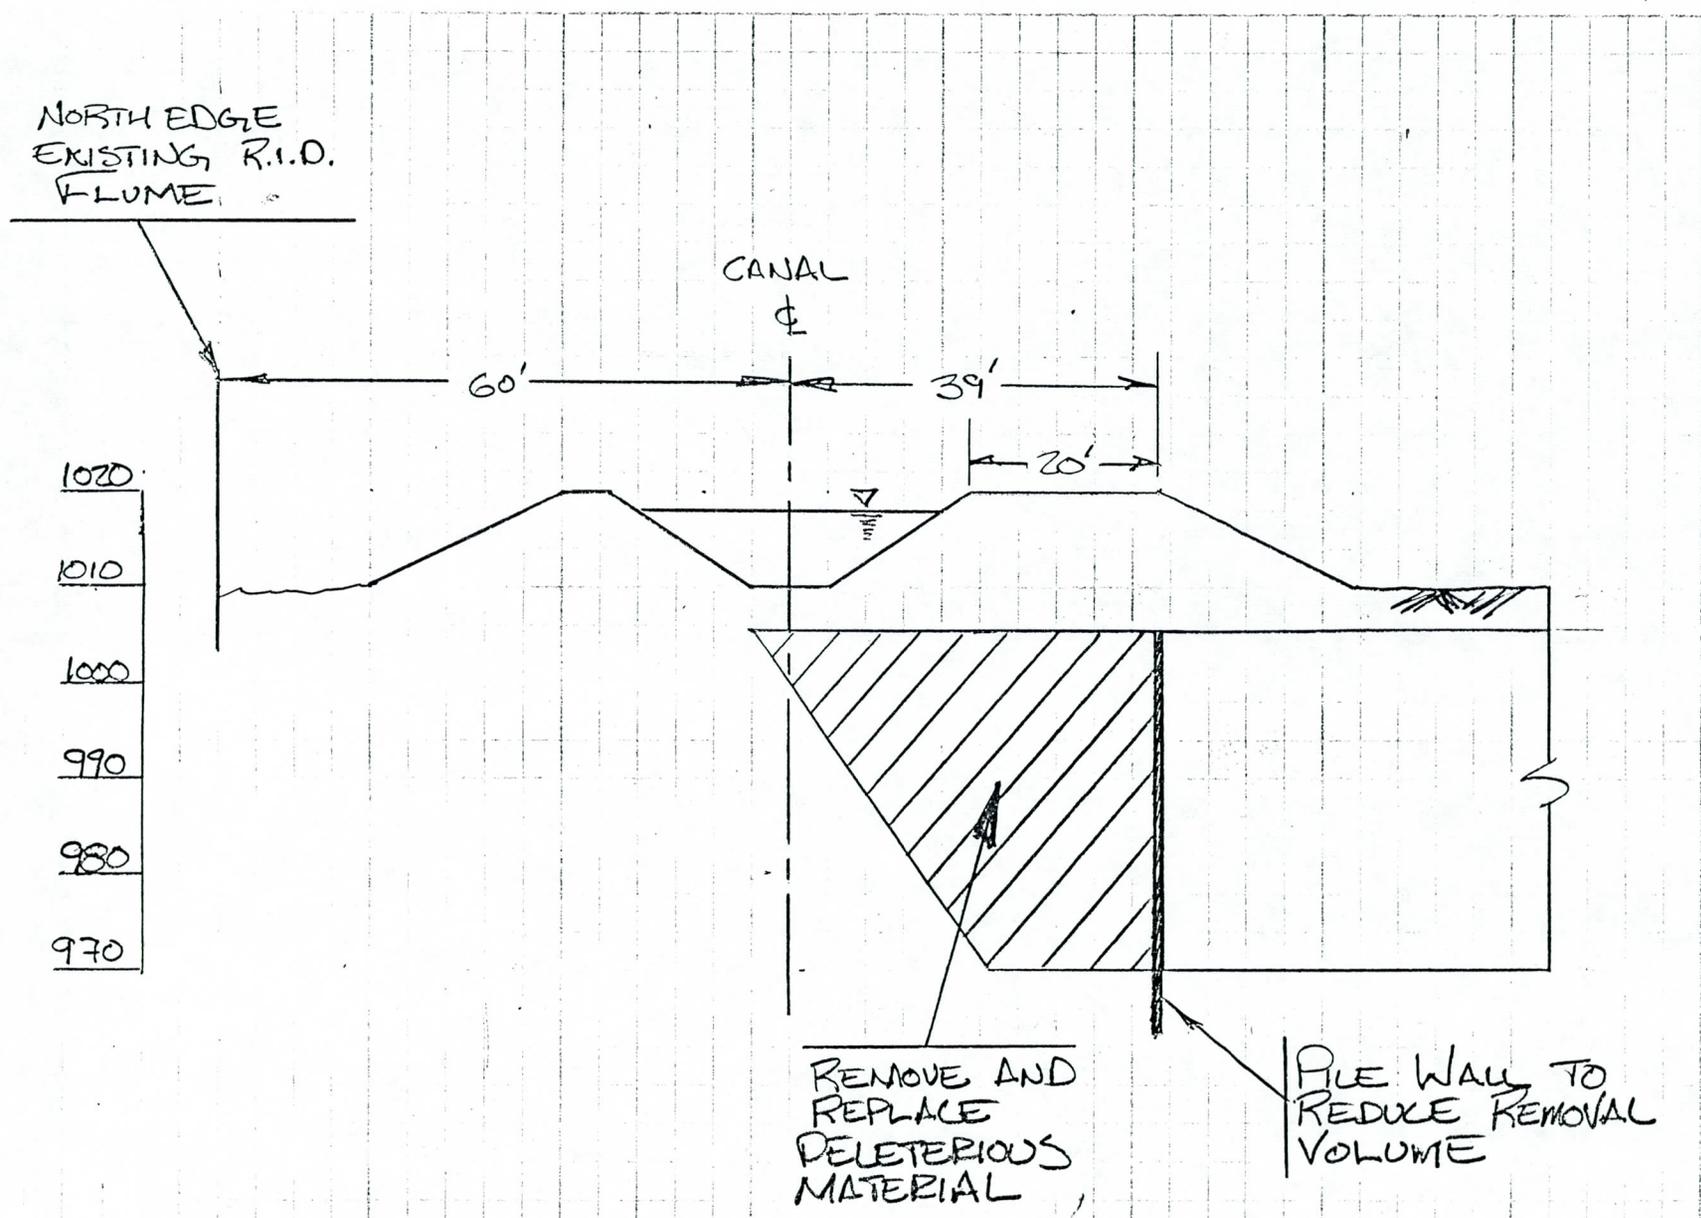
PILE WALL TO LIMIT EXCAVATION
